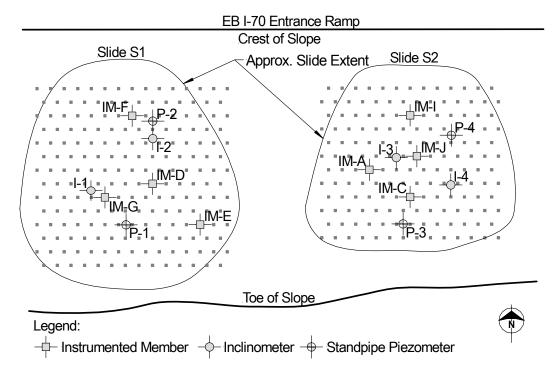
Plan view of slide areas S1 and S2 showing locations of instrumentation installed during Phase I at the I70-Emma site.
